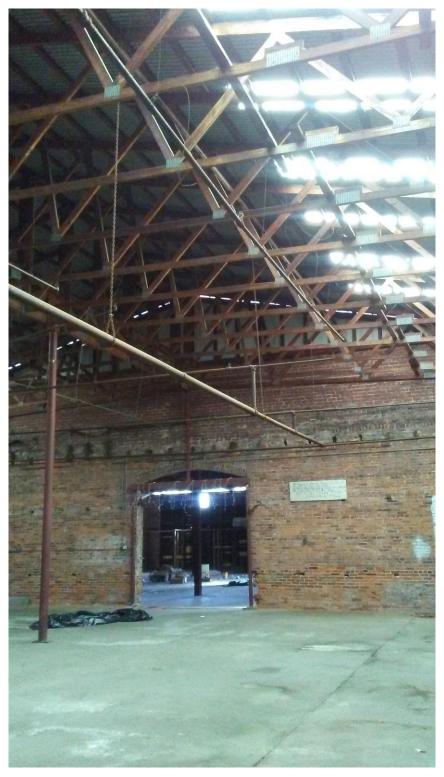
Interior Depicting Archway, Skylight, Masonry and Exposed Beams
